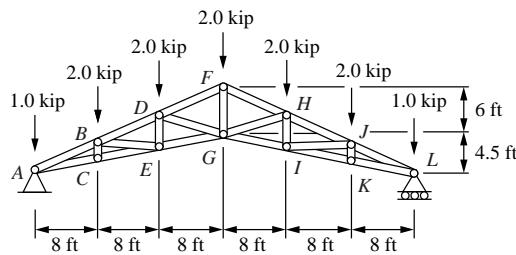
Howe scissors roof truss (FS = 2.0)
